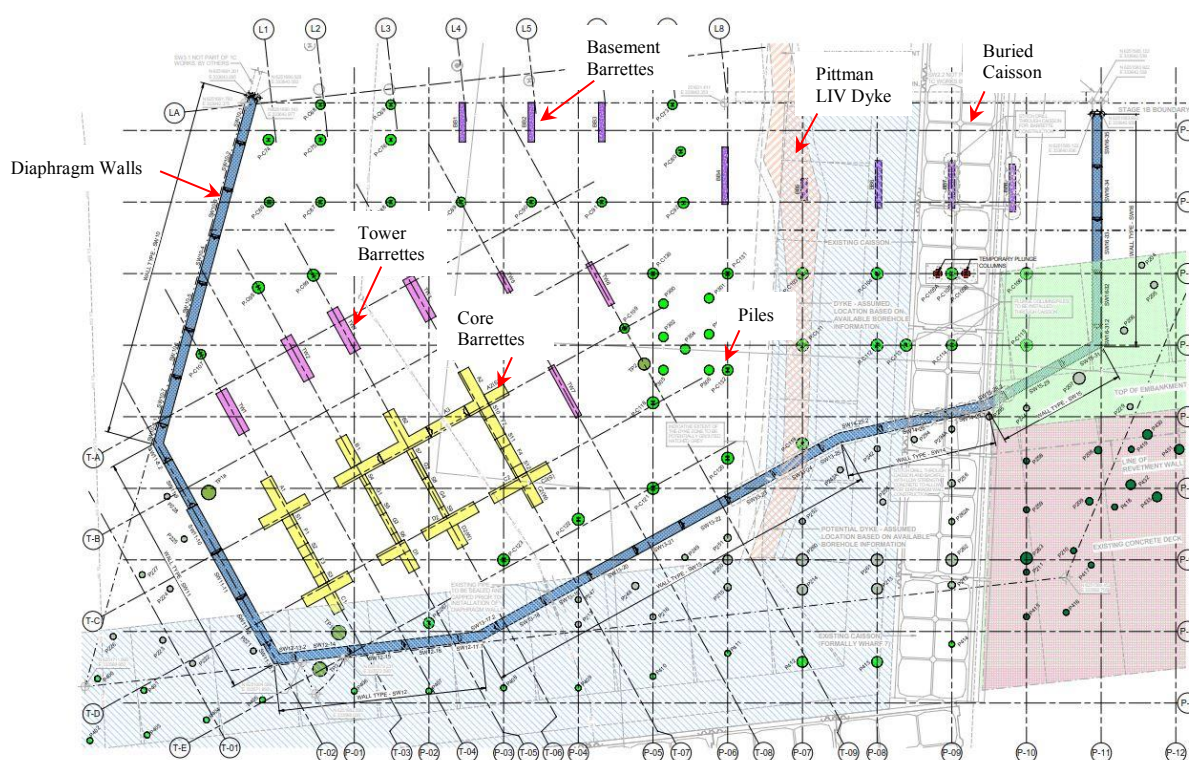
Crown Sydney Hotel Resort basement foundation plan
